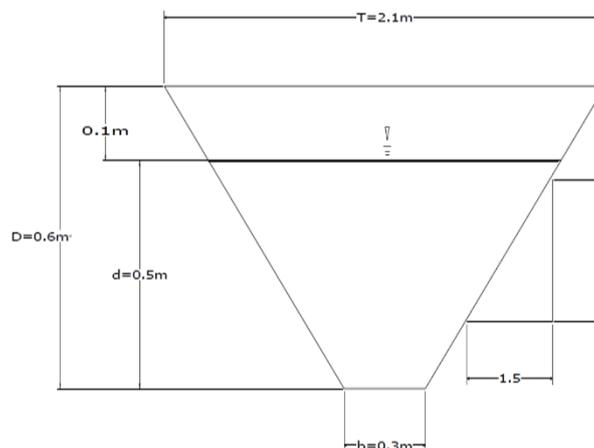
Schematics of the designed trapezoidal open channel hydraulic structure
